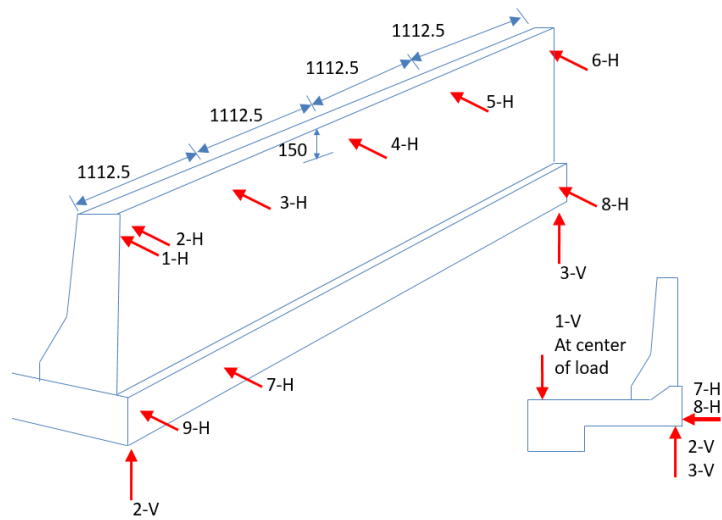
Arrangement of potentiometers (LVDTs and POTs) in specimen S-2
